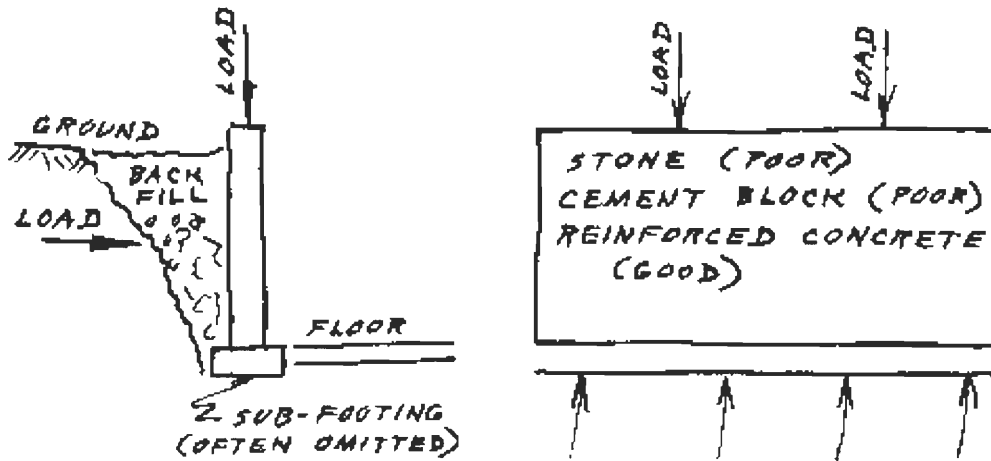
Wall footing with sub-footing to properly distribute weight. (Roberts, 128)
